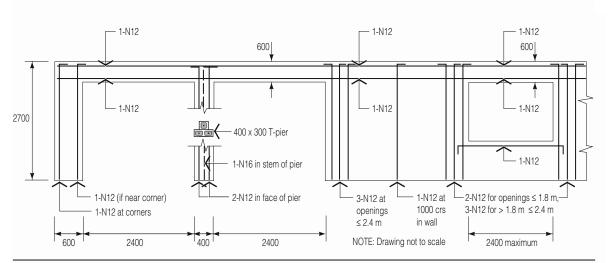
Wall Reinforcement for 140-mm Leaf for Wind Classifications N5 and C2 and 2700-mm Wall Height
